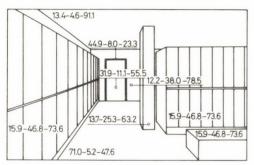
Colour design for a locker room for men (in a machine tool factory)
